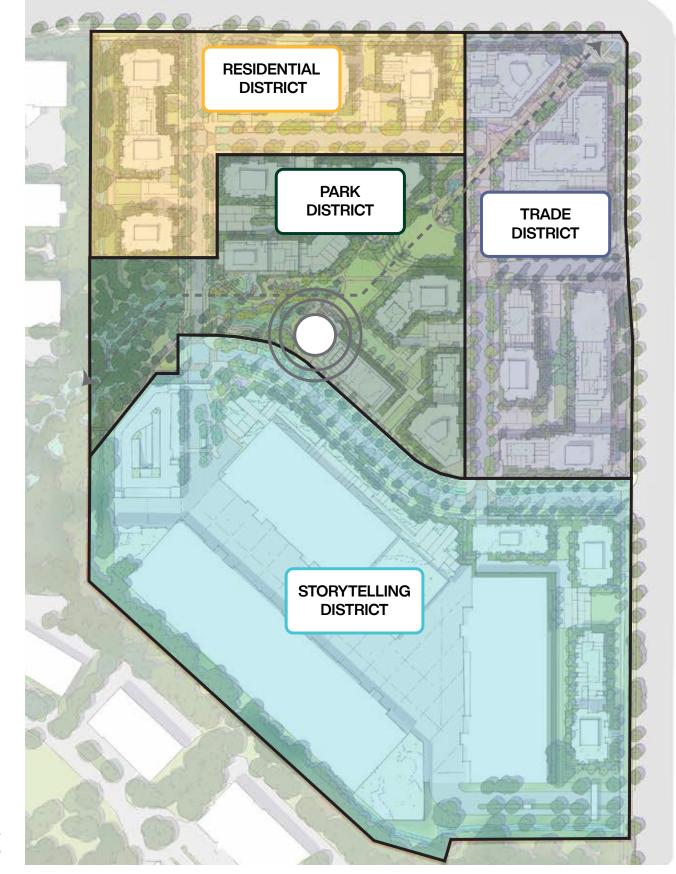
SITE PLAN -CHARACTER AREAS
